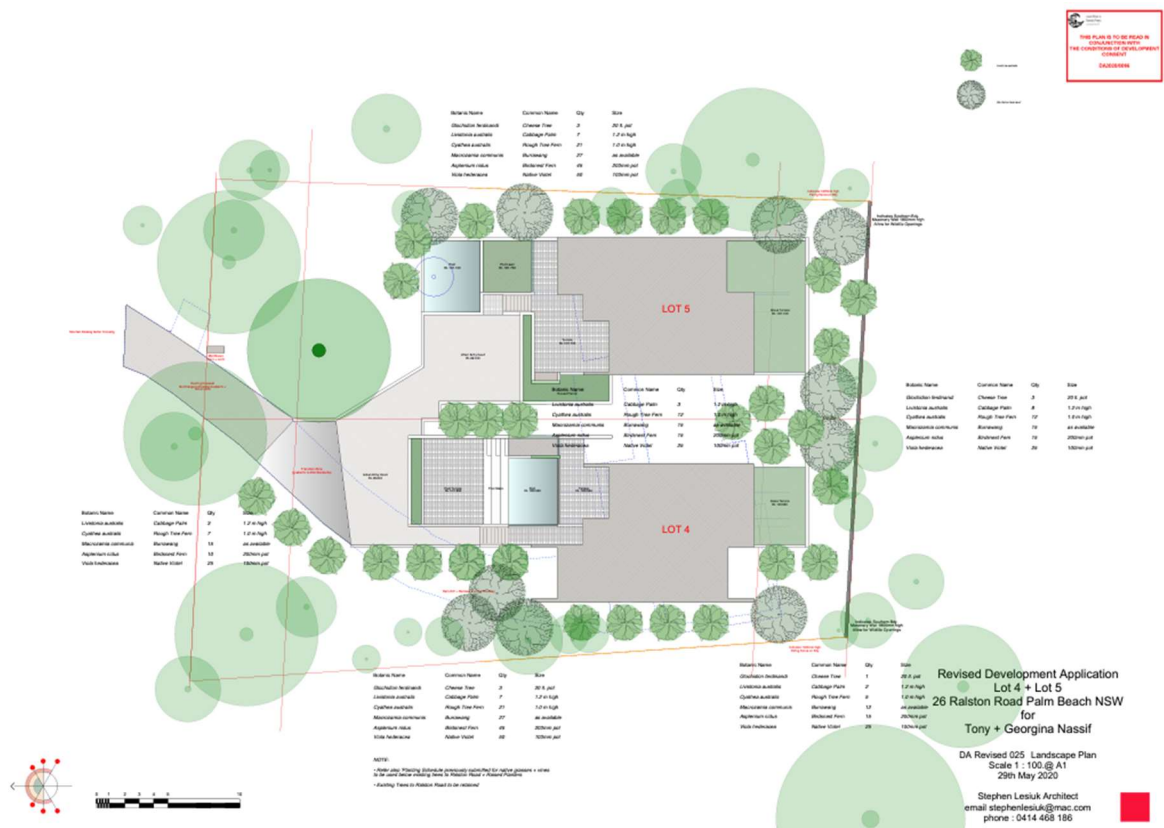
Approved Landscape Plan by Stephen Lesiuk Architect
